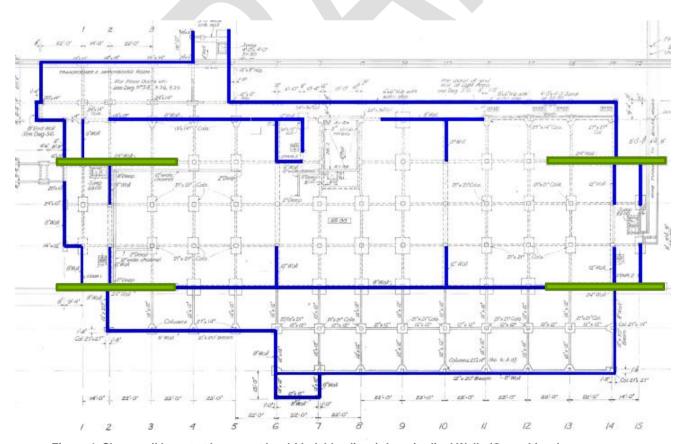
Shear wall layout at basement level (dark blue lines), Longitudinal Walls (Green Lines)
